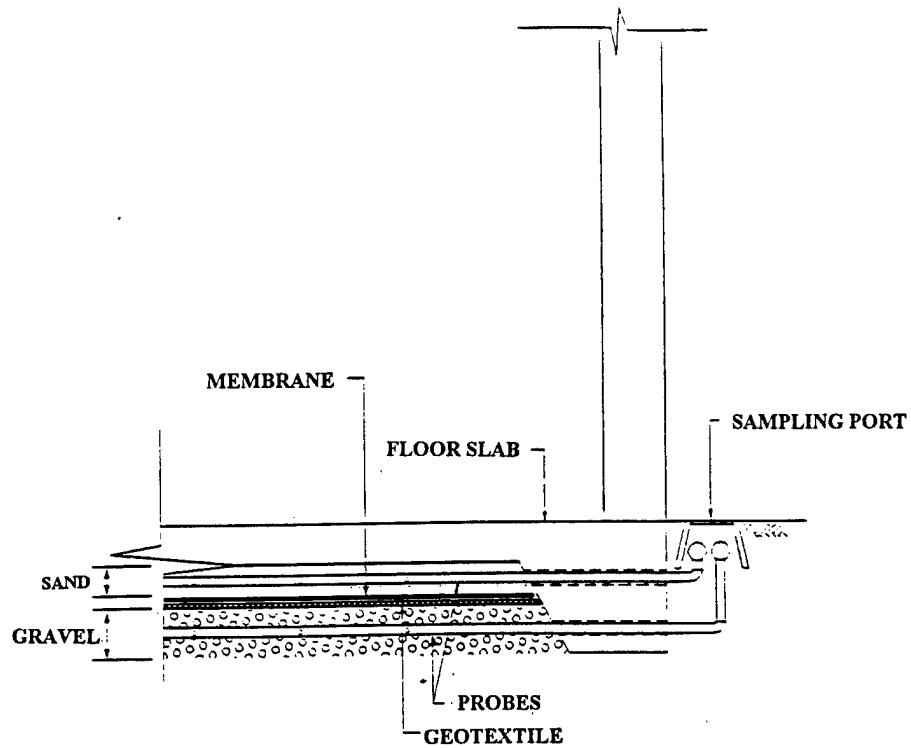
[a] Active Landfill Gas Control System, elevation view; (Source: 32)
